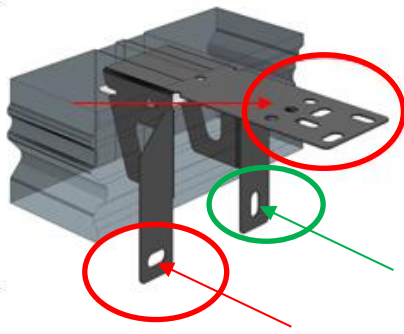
Location of couplings in beams with internal anchors - min. one per sheet plate from above – stably and as far as possible from the edge of a wall.
